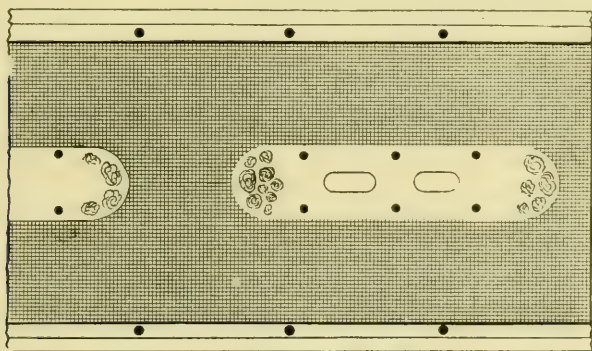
Plan of street with parkway and 6-foot tree belt.
